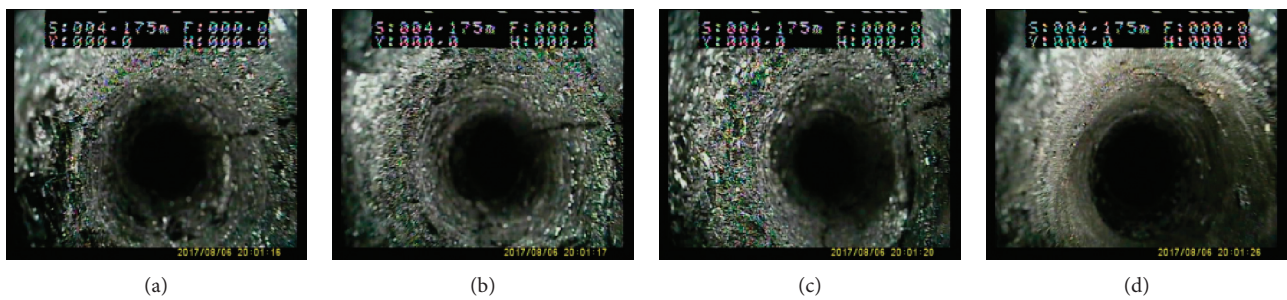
The distribution of the surrounding rock (2.3–2.8 m) outside the anchor zone. (a) 2.3 m. (b) 2.5 m. (c) 2.7 m. (d) 2.8 m.
